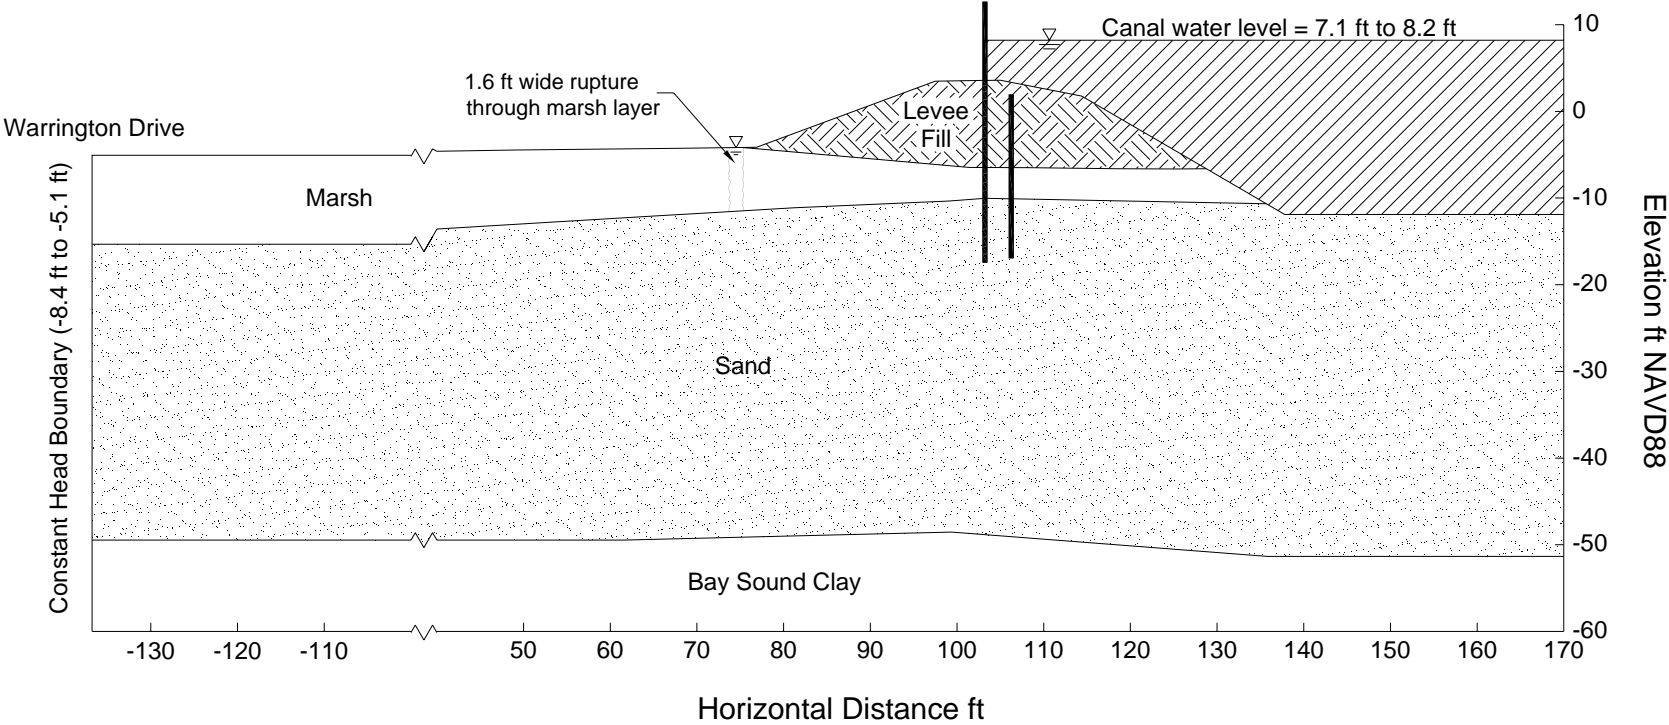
Schematic cross section at London south breach, showing rupture through marsh layer.
